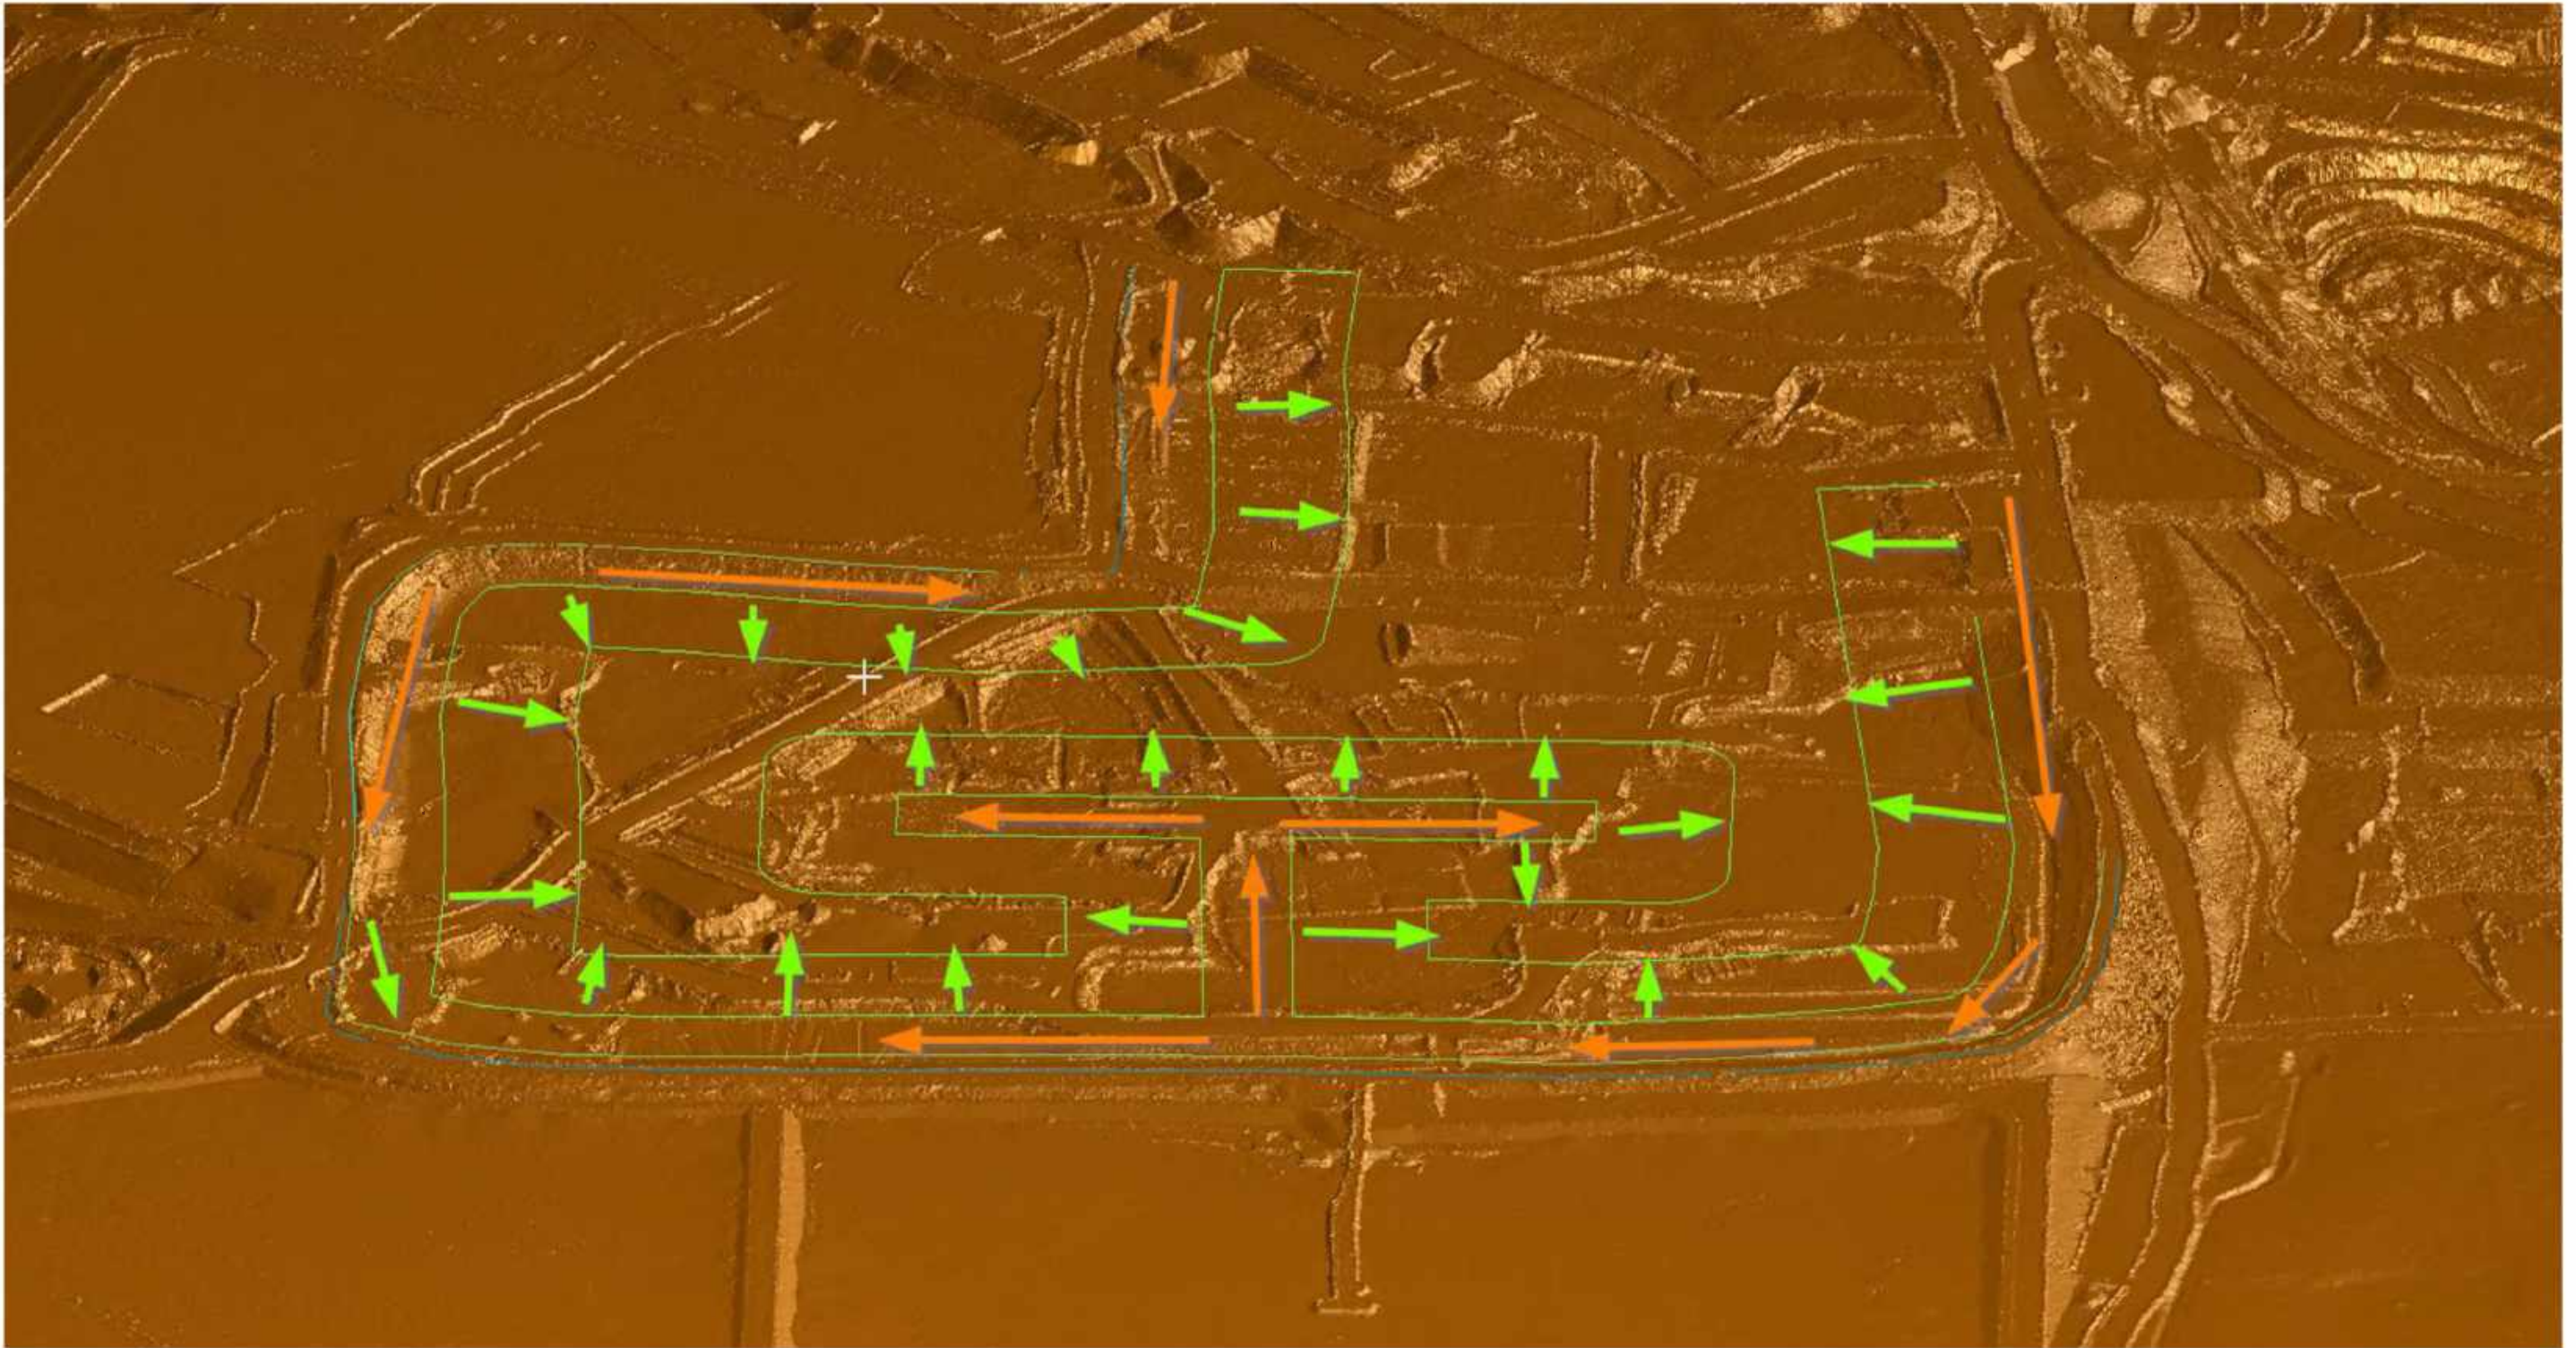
Tailings Storage Facility #1 Ore Stockpile General Arrangement
